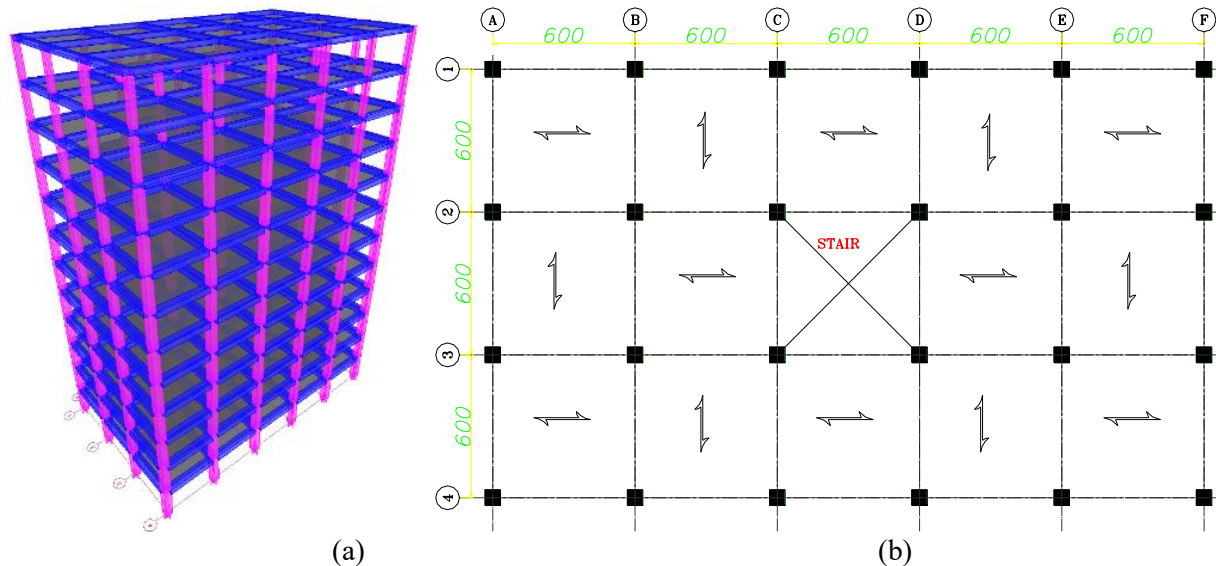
Structural elevation and plan: (a) 12-story building and (b) typical plan.
